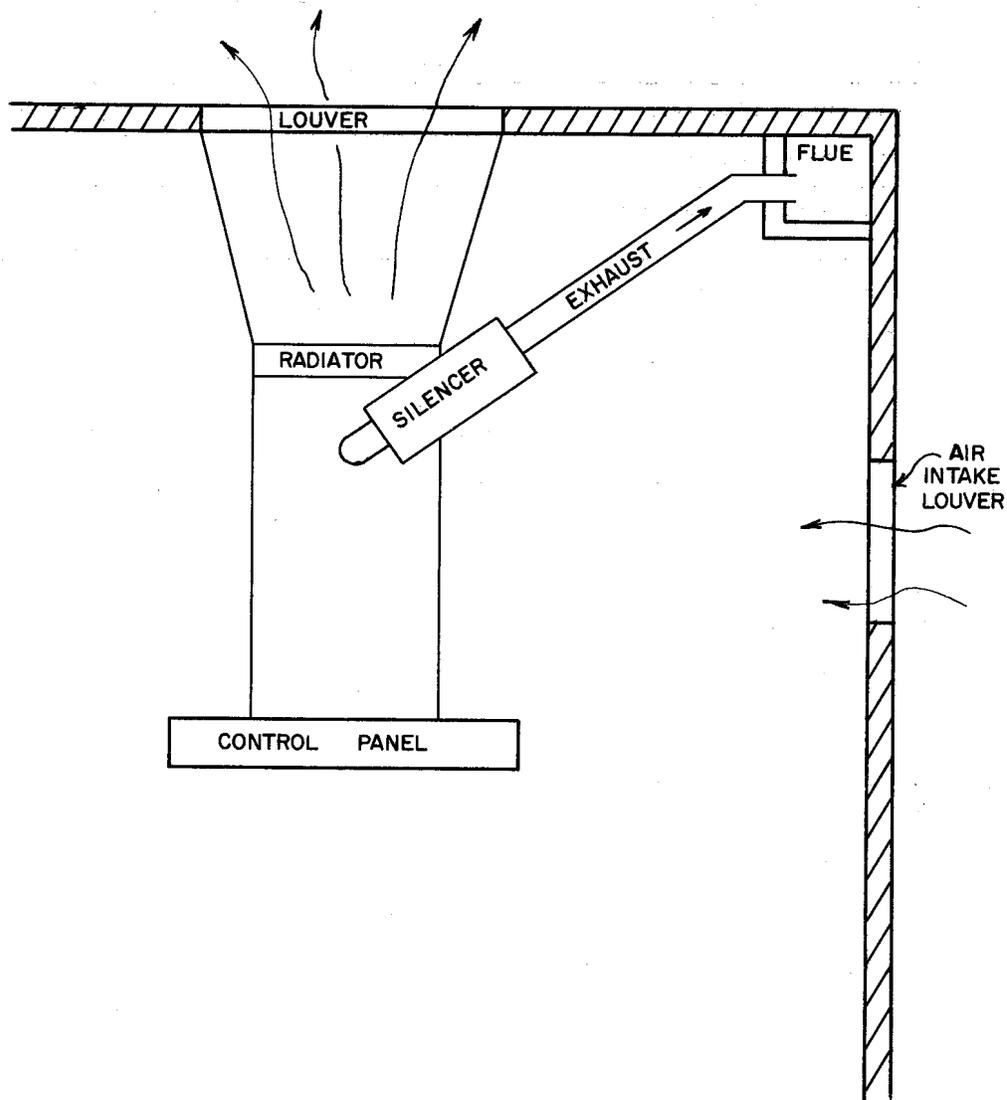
Typical Diesel Emergency Engine-Alternator Layout
